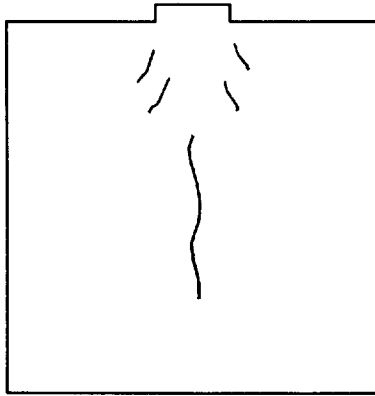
Main fracture pattern of strip punch test (at point A of Figure 3.3.1.14)
